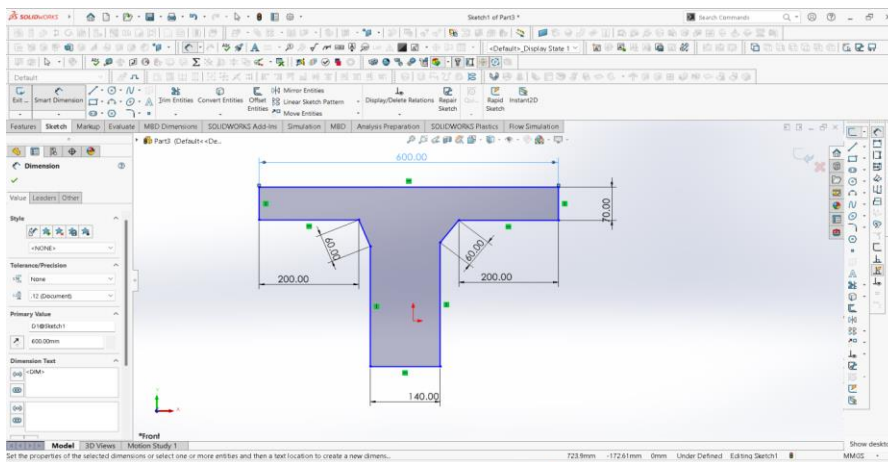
2D sketch new model of T beam with exiting model in solid work 2021
